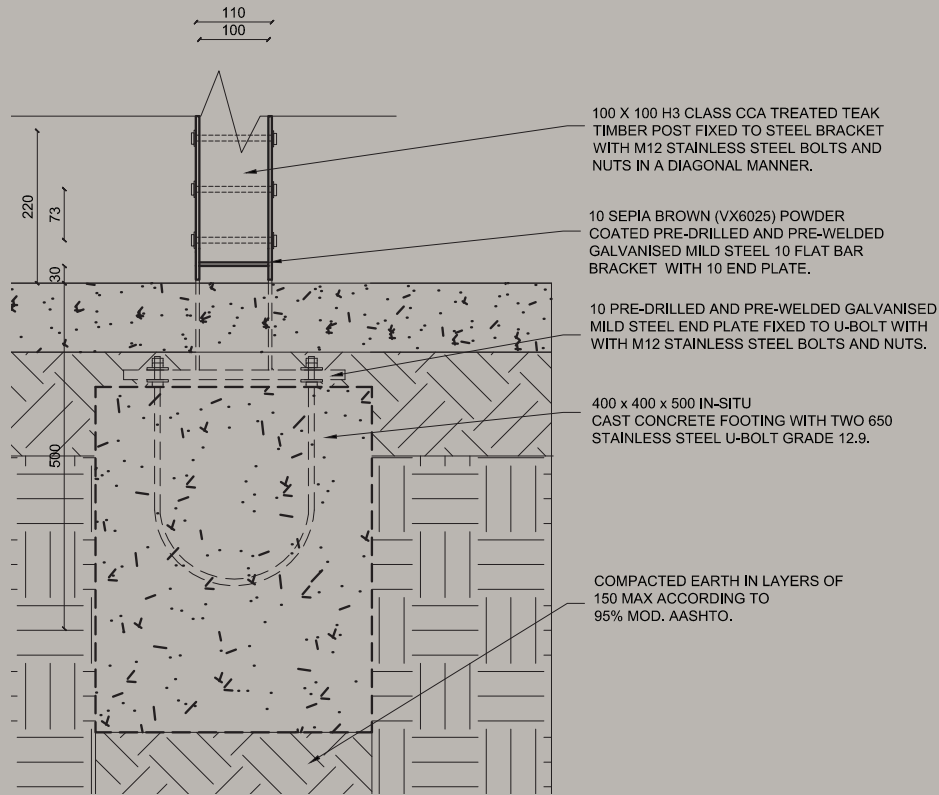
Detail Section (1:10) of Typical Timber Post Fixing (Author, 2014).
